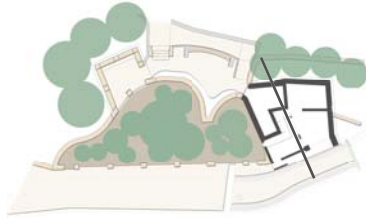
Indoor Holding Facility Layout (Morrow, 2009).
